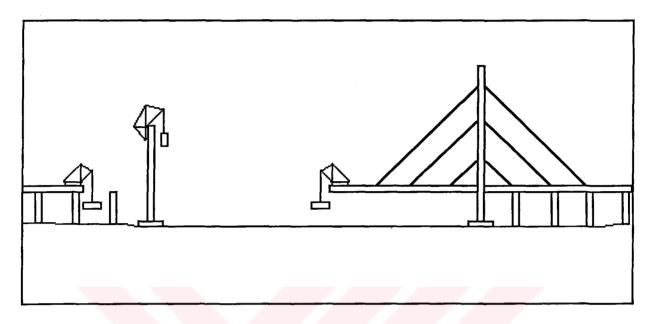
ERECTION PROCEDURE FOR A CABLE STAYED BRIDGE
